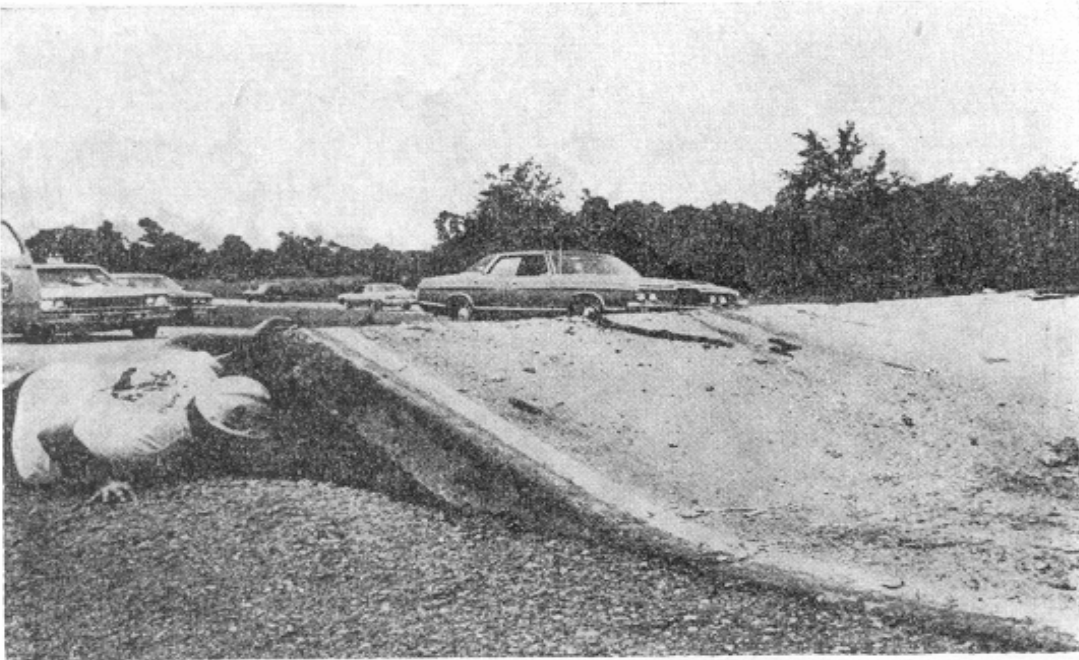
Blowup of concrete highway pavement in Ohio, 1975
